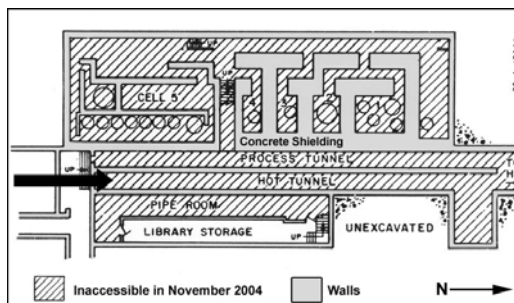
Building G2, Basement, 325-Foot Level, Hot Tunnel
